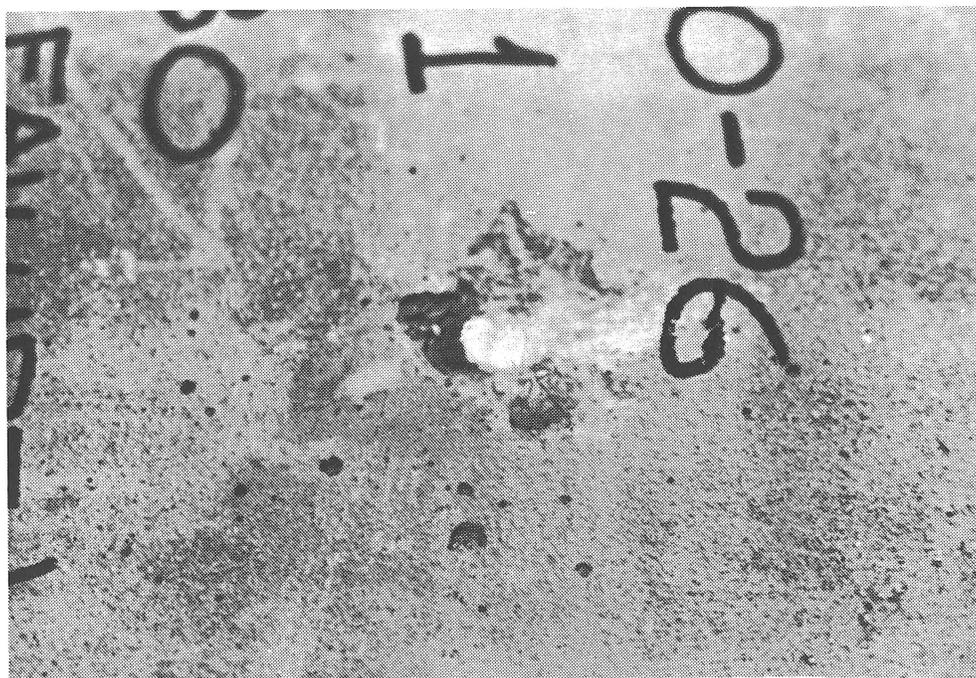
Specimen S-1. Detail of Sheared Stud in Concrete
